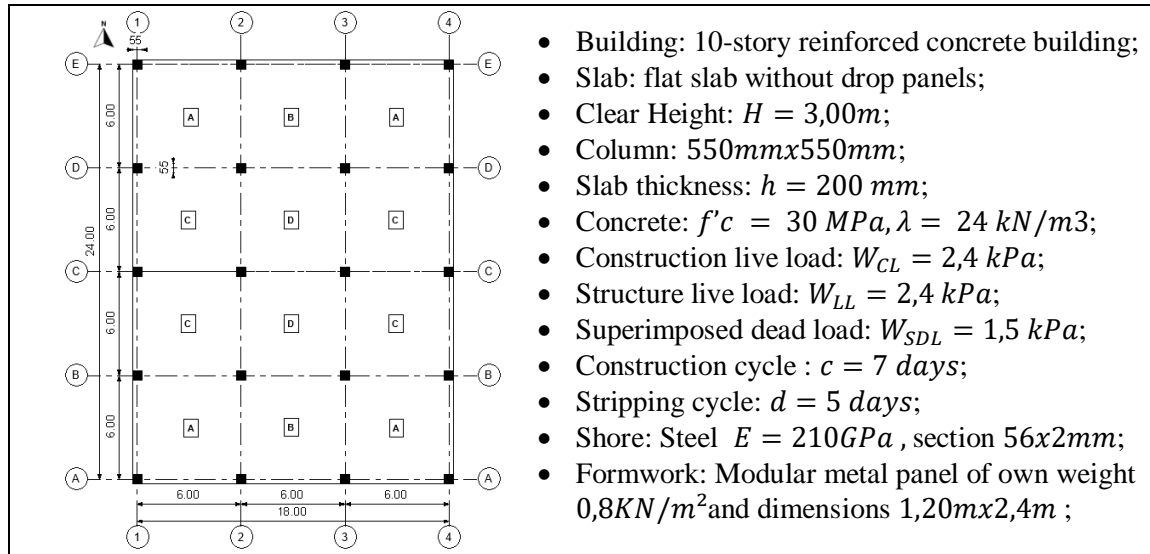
Plan view of a typical slab floor for the study case and parameters
